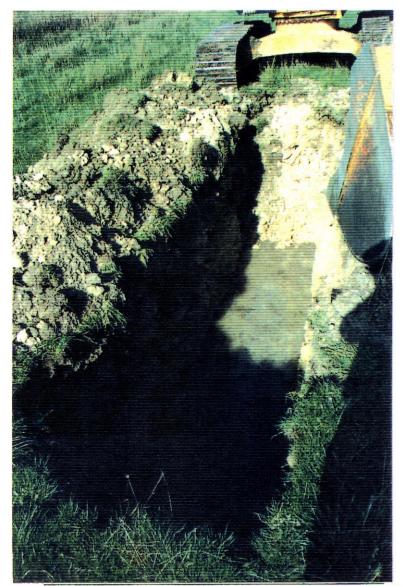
Pit 10 - Note stable walls, high SWL after rapid recovery. Photo No. 40287
